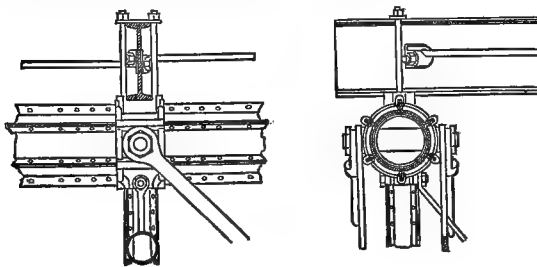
Details of Deck Bridge, top of Post with Cross-Girder C .
